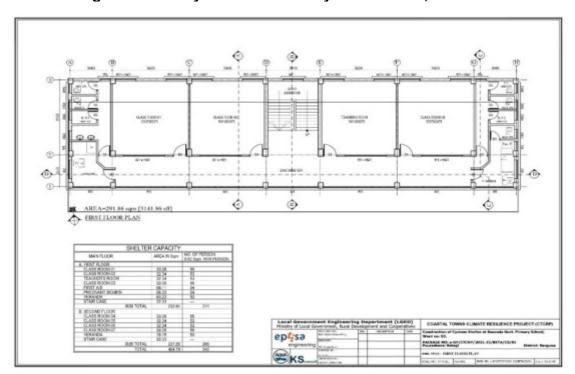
Site Layout Plan for the Cyclone Shelter, First Floor
